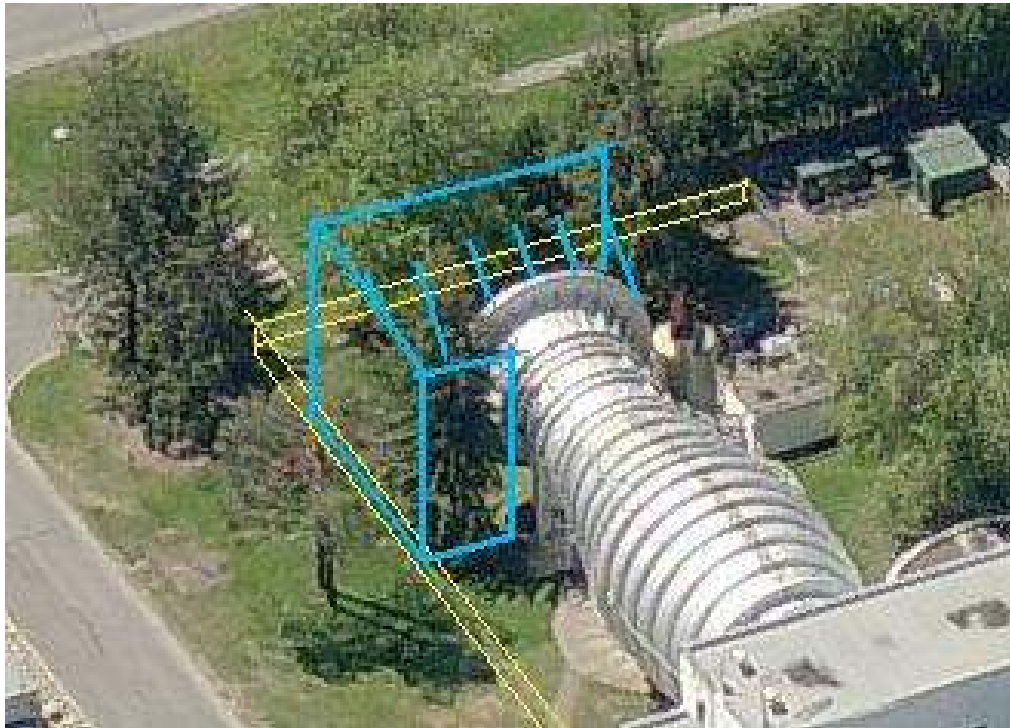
M46 Wind Tunnel Intake Barrier Wall – Concept View 3.
